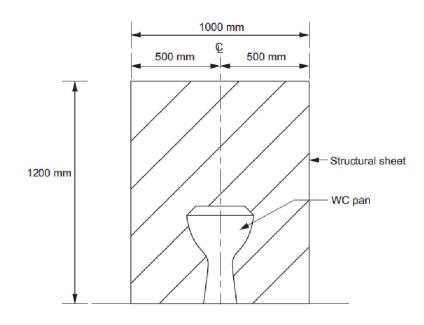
Minimum extent of sheeting for wall adjacent to a toilet pan
